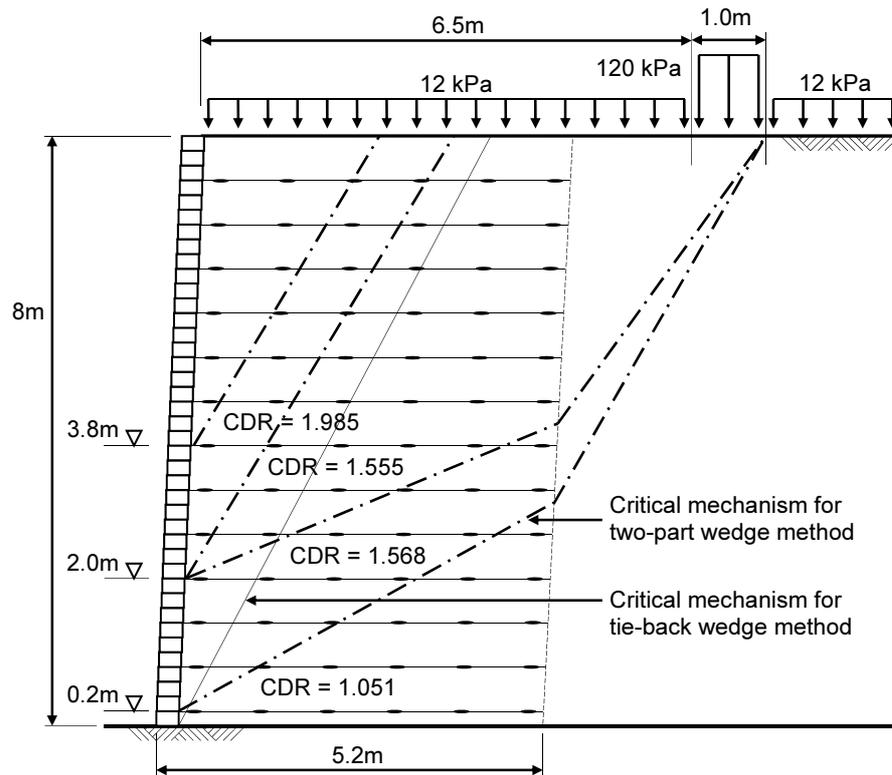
Design example of 8m high modular block wall with isolated surcharge of 120 kPa behind the reinforced zone
